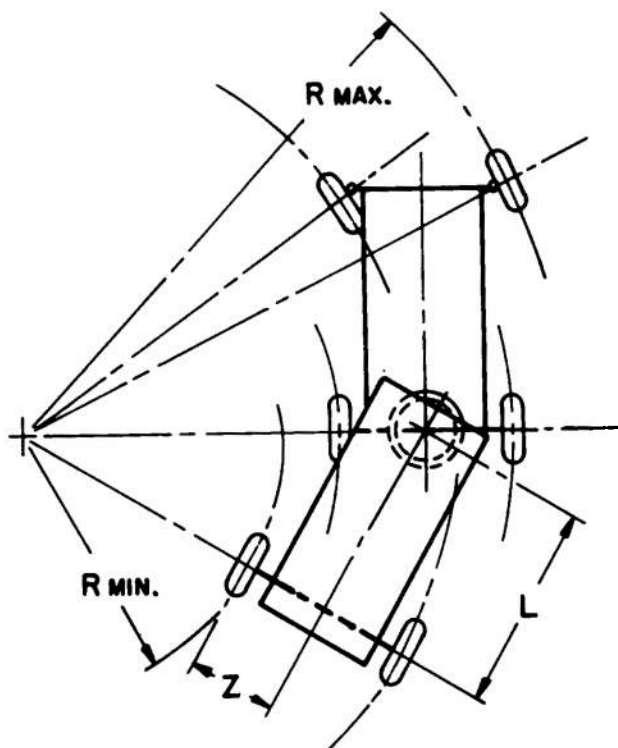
Turning-Radius Diagram for Tractor and Trailer Steering
